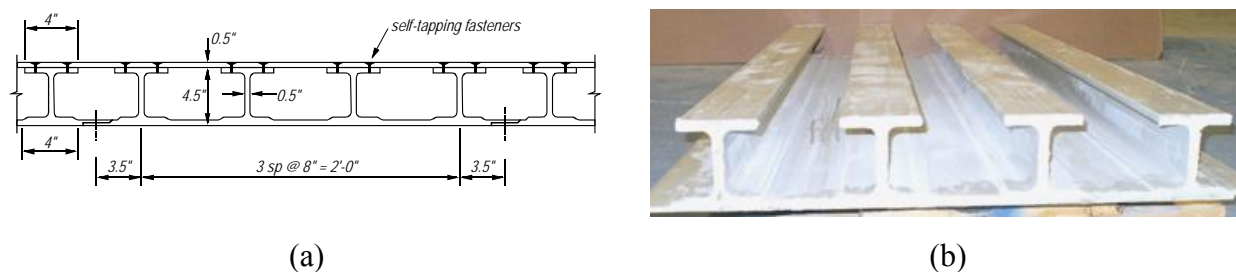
GFRP deck configuration (a) typical section (b) single bottom panel section shown without top plate
